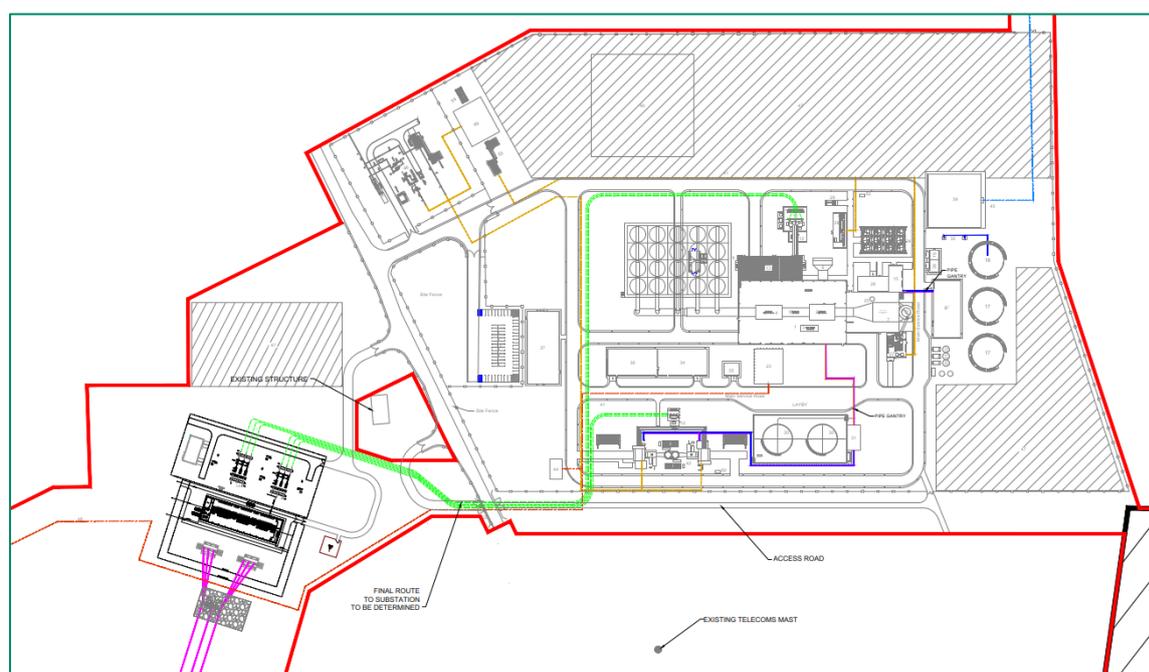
Proposed Site Layout (Source: Drawings No. S7060-8310-0001)
